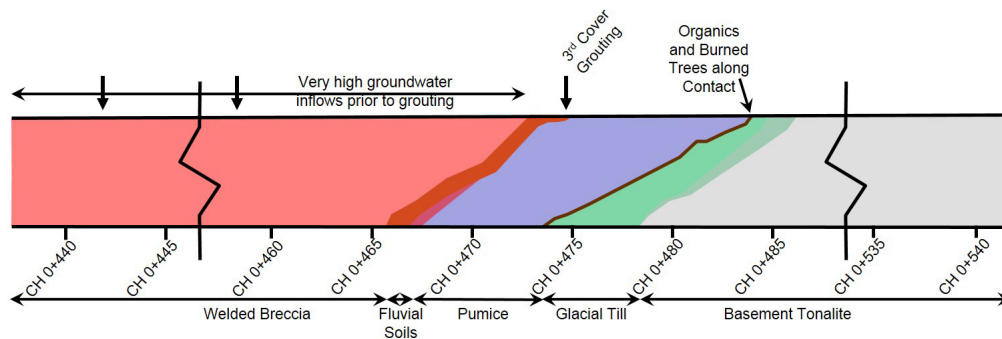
Schematic tunnel profile through the transition zone soils, showing the deposits encountered along the tunnel excavation.
